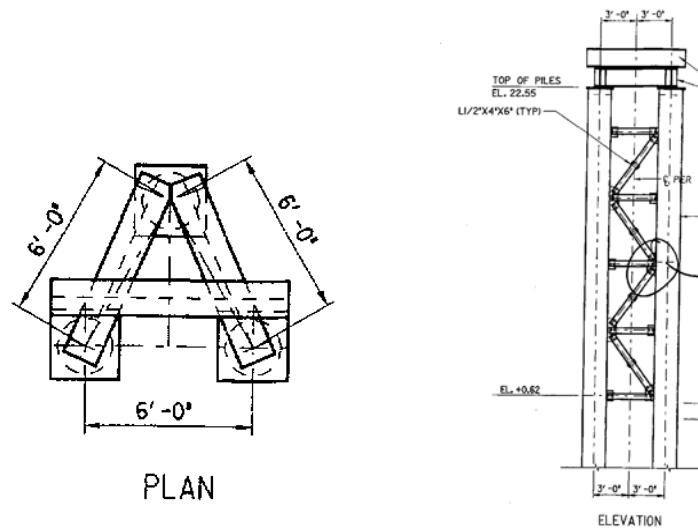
Plan and Elevation Views of the Temporary Structural System, *Courtesy of Bridge Concepts*³
